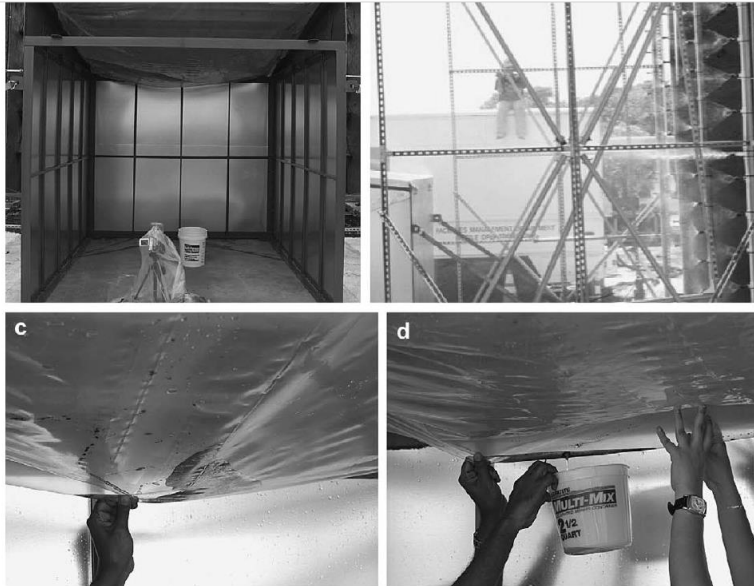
Water monitoring and collection setup. (a) Complete setup with camera and plastic ceiling, (b) the test specimen from bird's view, (c) leaked water through the roof layer and (d) water collection [104].
